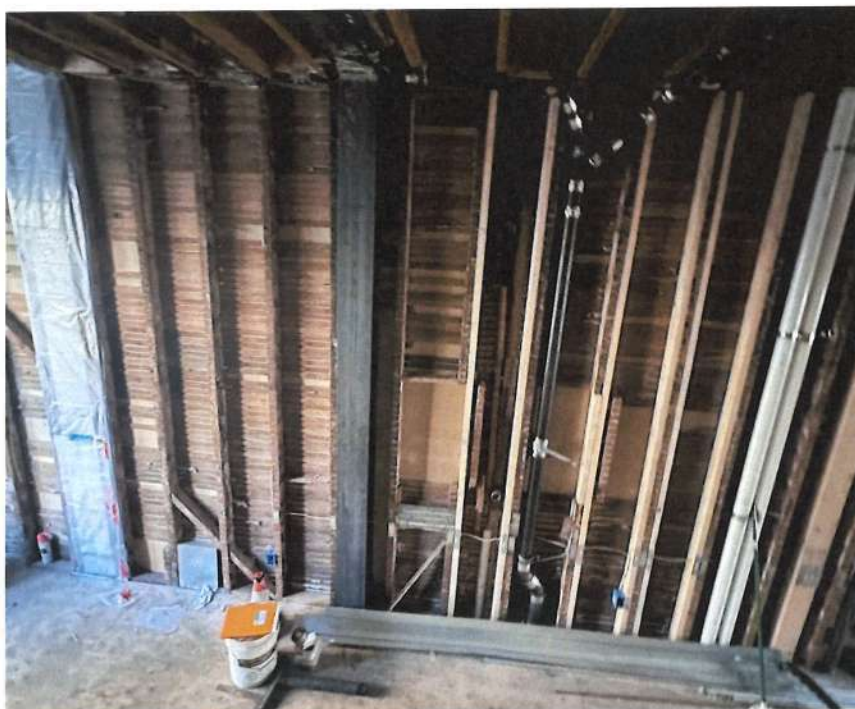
Level 1 party wall construction with original wood studs (dark color) and new lumber (light color)
